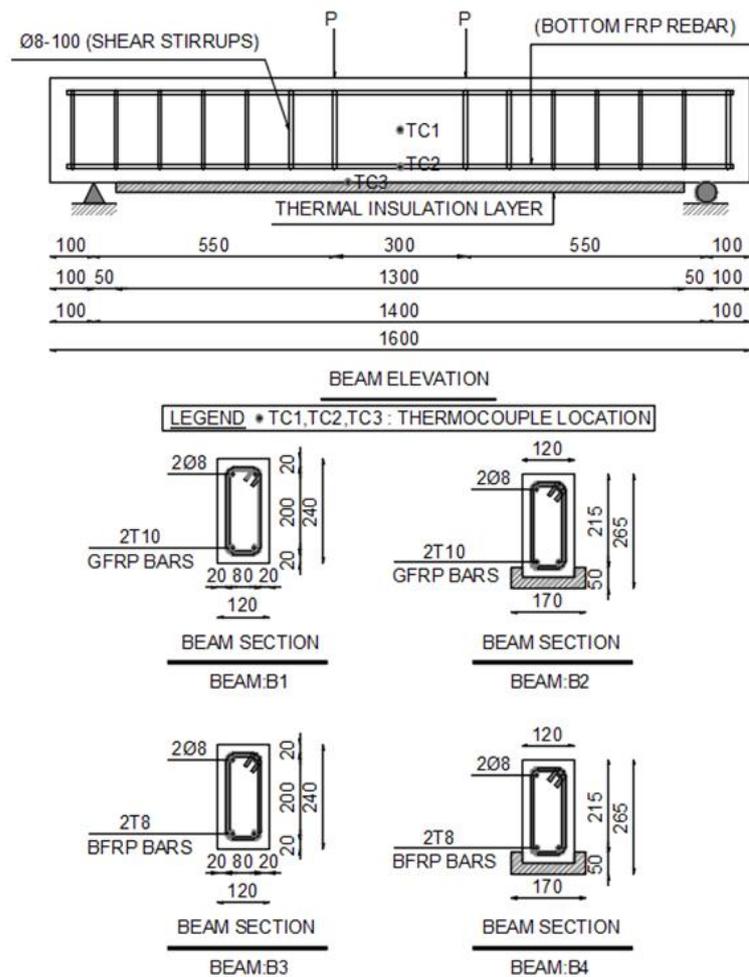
Beam elevation and cross-section details (dimensions in mm).
